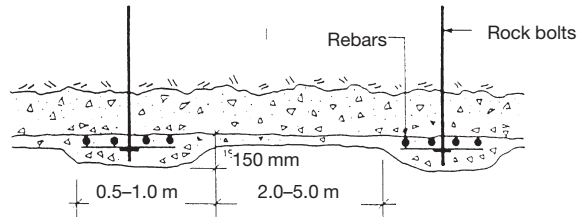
Support with ribs of fibre reinforced sprayed concrete
